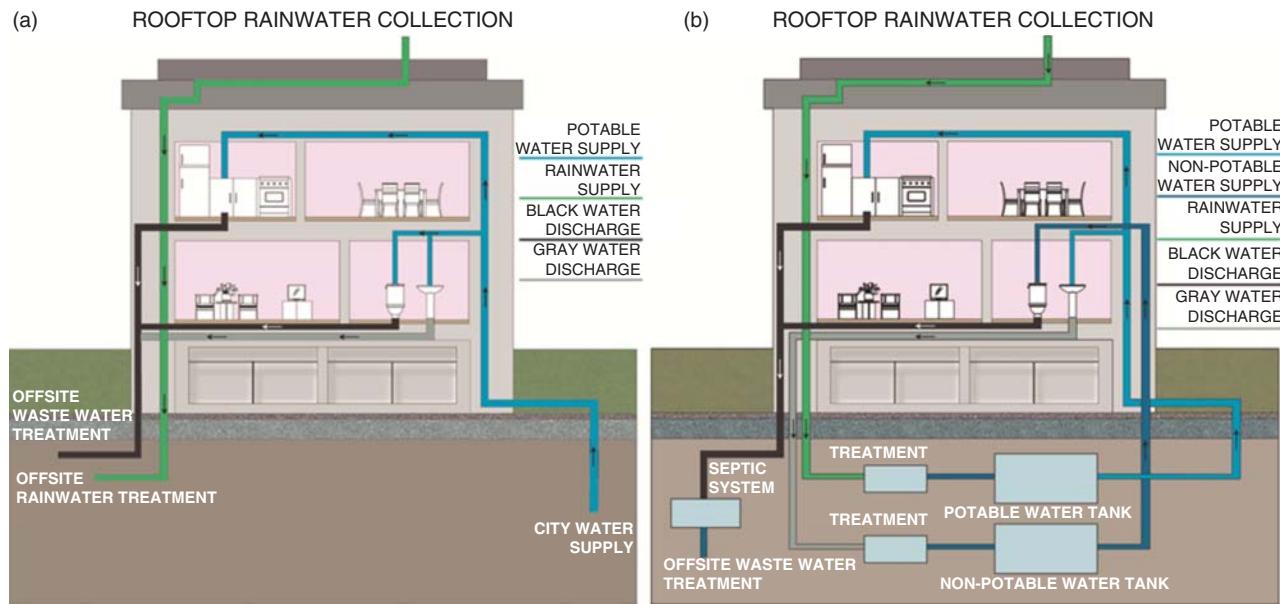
(a) Traditional building; (b) Net-Zero water building. Source: Adapted from Silva et al. 2019.
